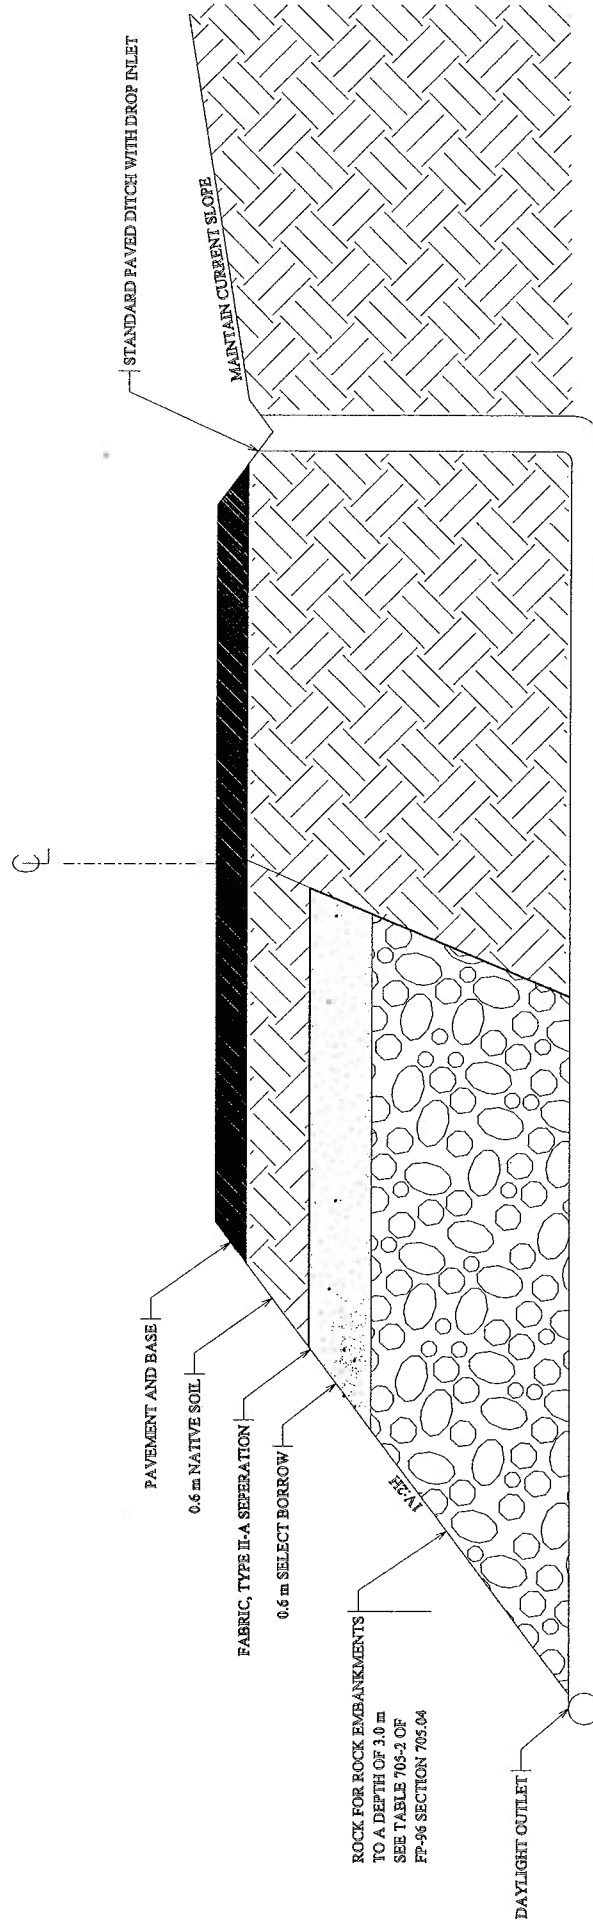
SUB-EXCAVATION SCHEMATIC FOR SITE B-1, SITE C, AND SITE D
